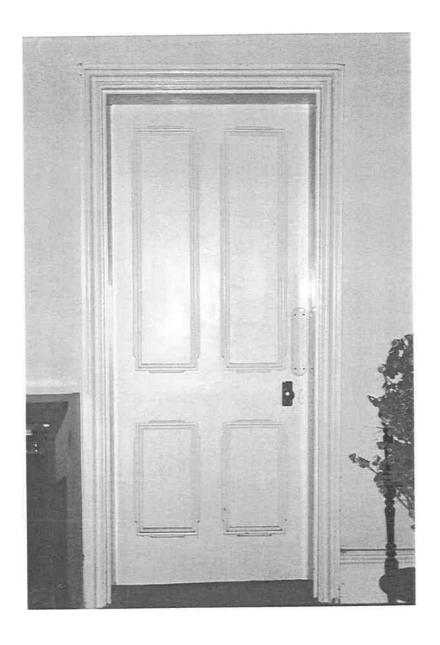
Detail of door panel between living room in east wing and central room (Photograph taken October 1995)
